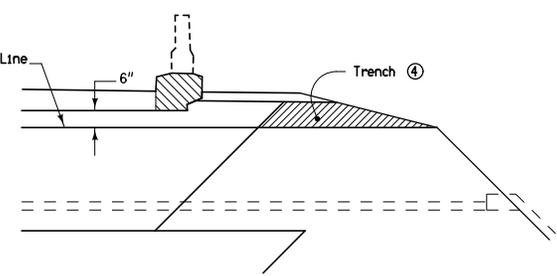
DETAILS OF CULVERT ABANDONMENT WITH FLOWABLE MORTAR
